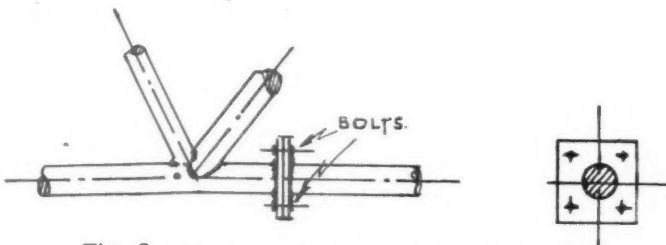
DETAIL. JOINT FOR SMALL SPANS.
